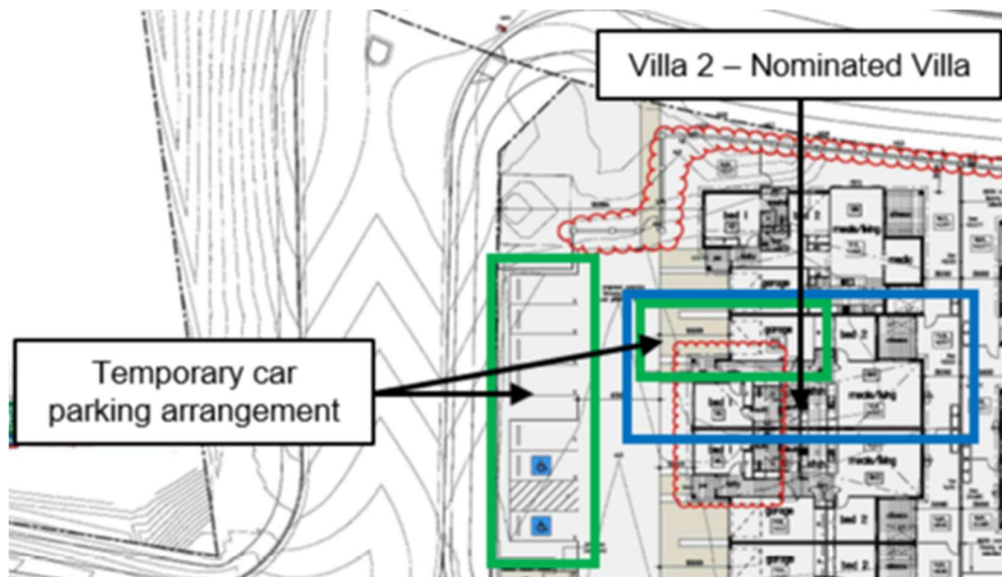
Temporary car parking arrangements (Source: A&N Design Group)
